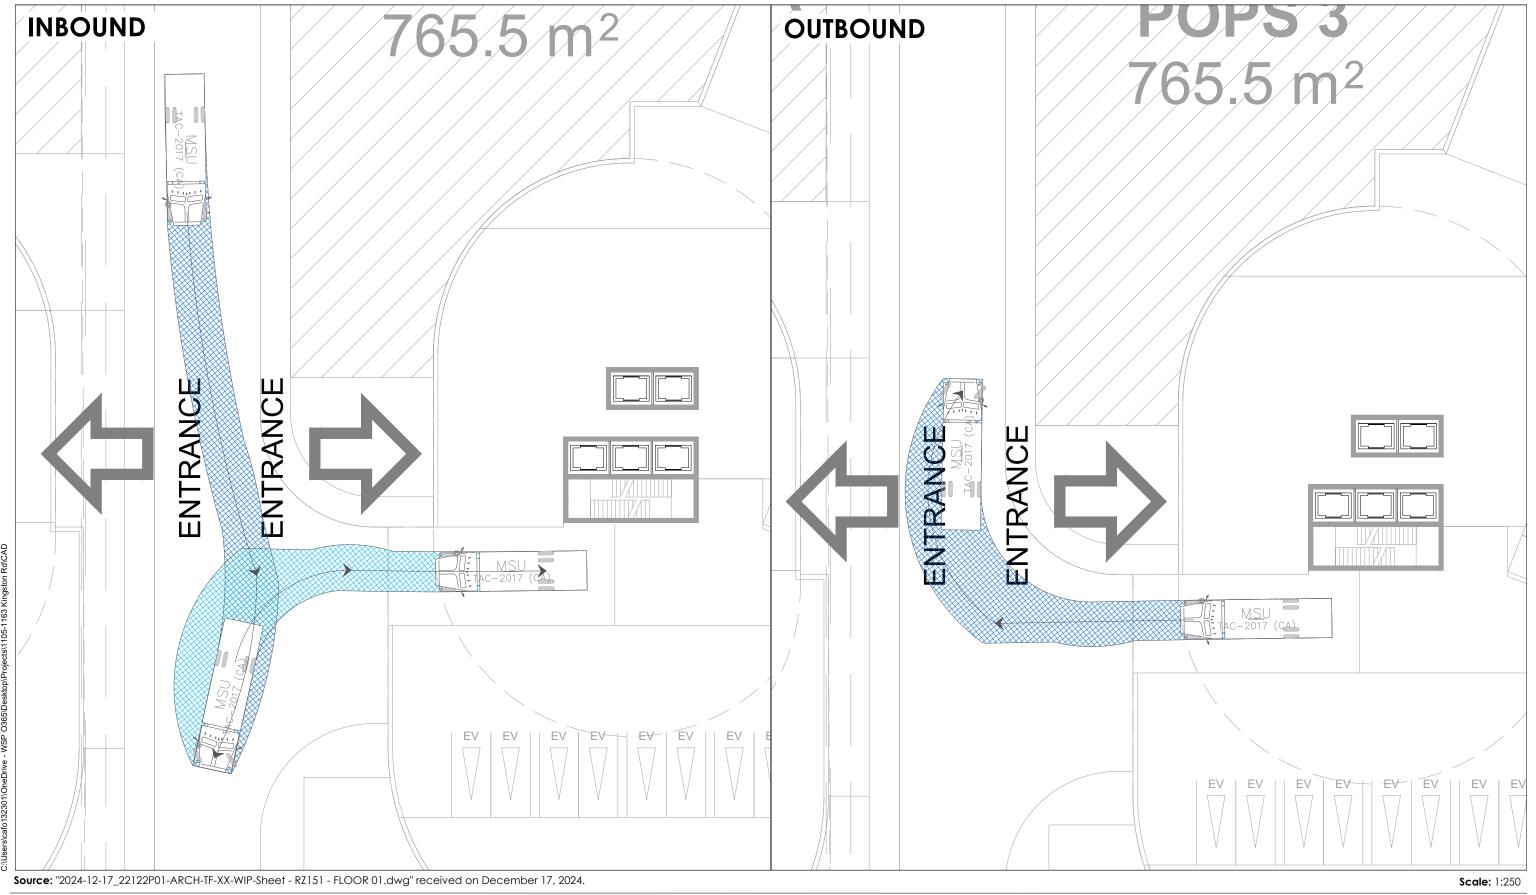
MSU Loading Truck Turning Maneuver - Building A - Retail Space 2 1105-1163 Kingston Road, Pickering
